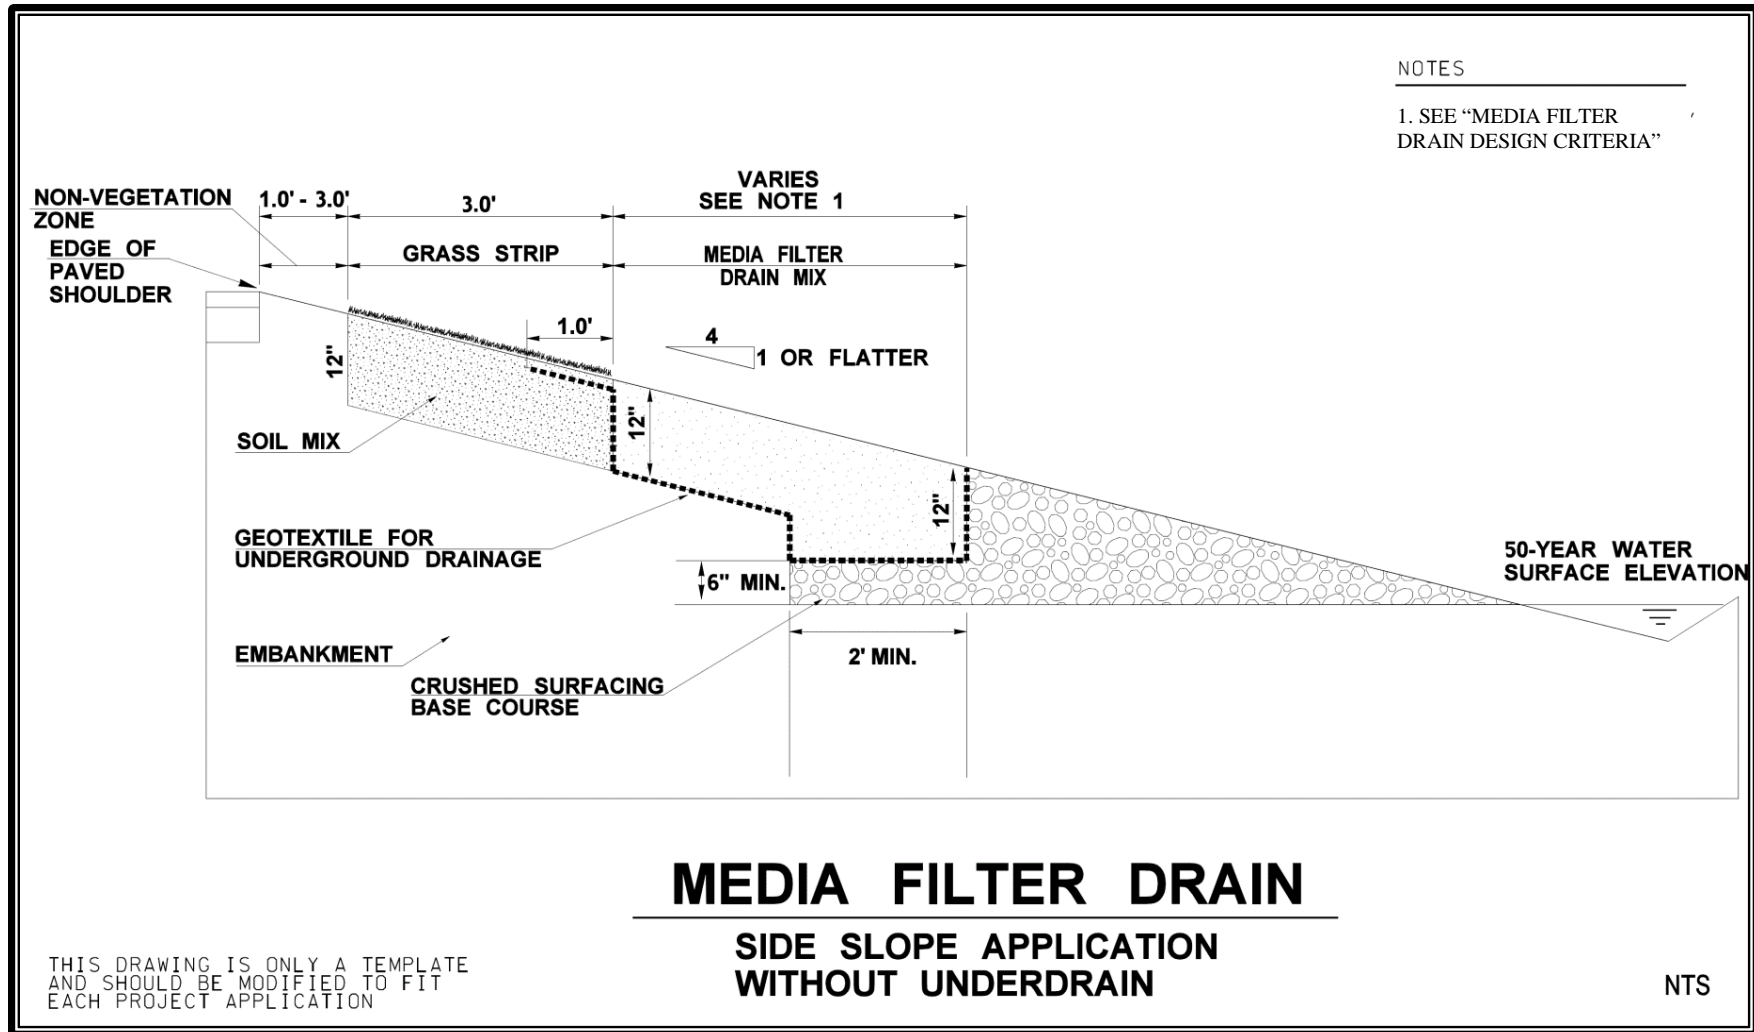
Media Filter Drain Without Underdrain Trench.
